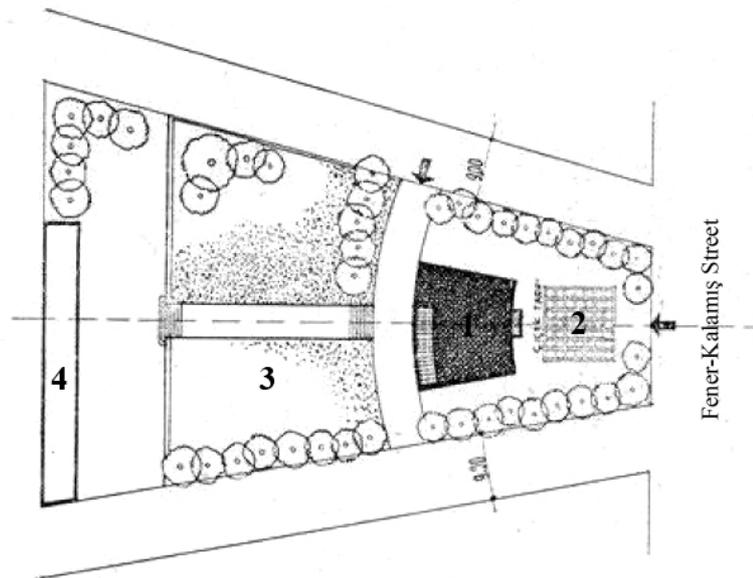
Site plan of the house in Kalamış by Zeki Sayar (1937).³¹⁵
